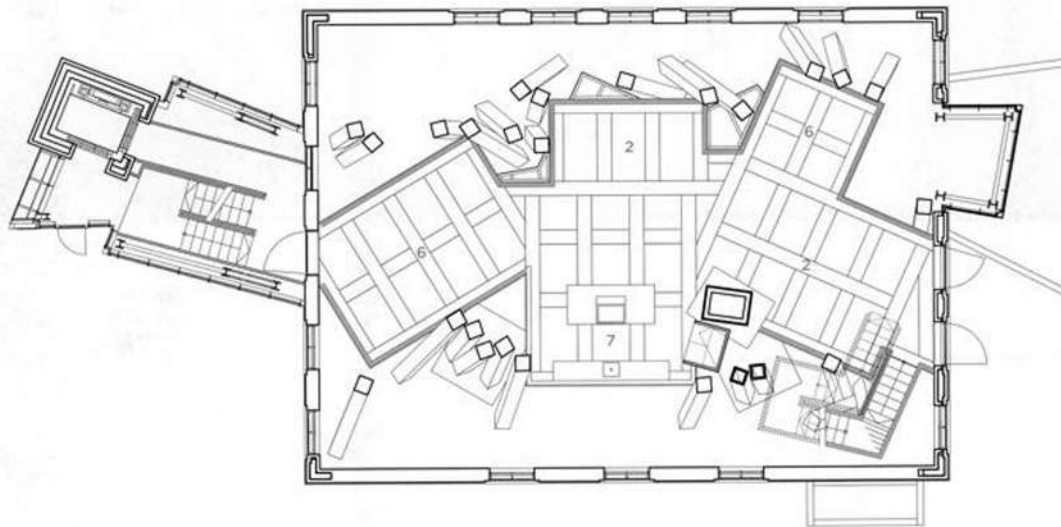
The floor plan of Hejmdal, photo: arkitekturbilleder.dk
